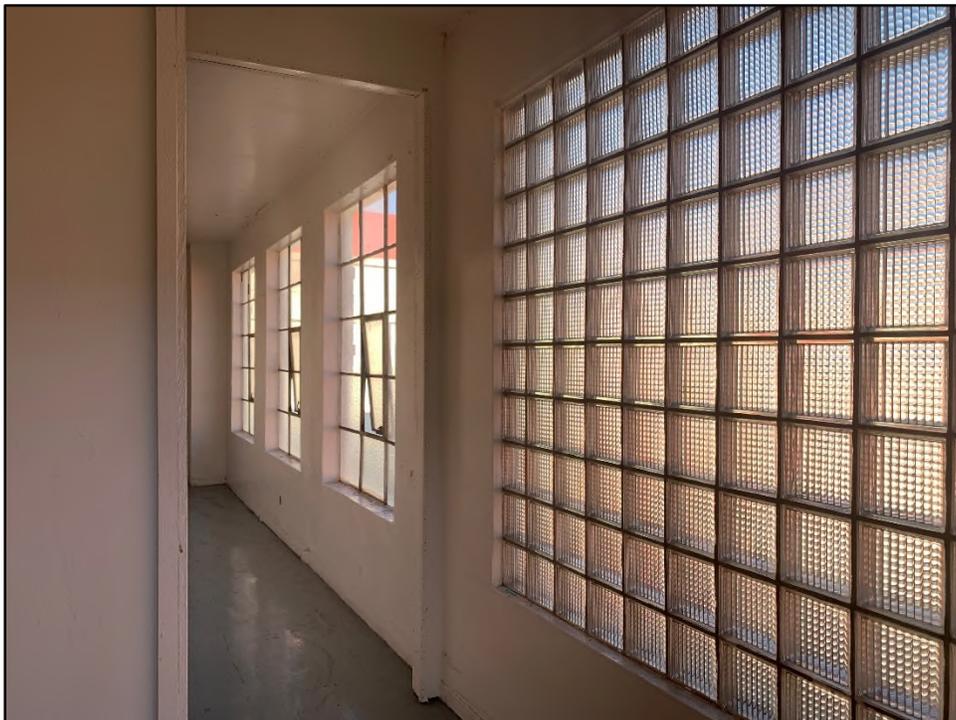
Interior of Building L, view of the north end of the building, looking toward the northwest.
